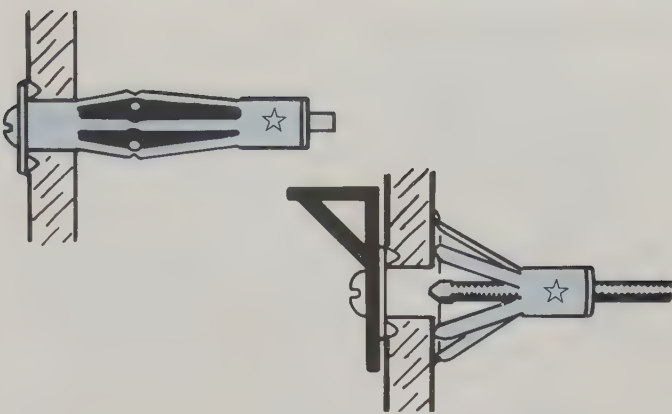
A hollow wall anchor is inserted in a drilled hole, then expanded by tightening the screw. The legs are permanently expanded inside the hollow wall, allowing the screw to be removed and replaced as necessary. (Star Expansion Company)
